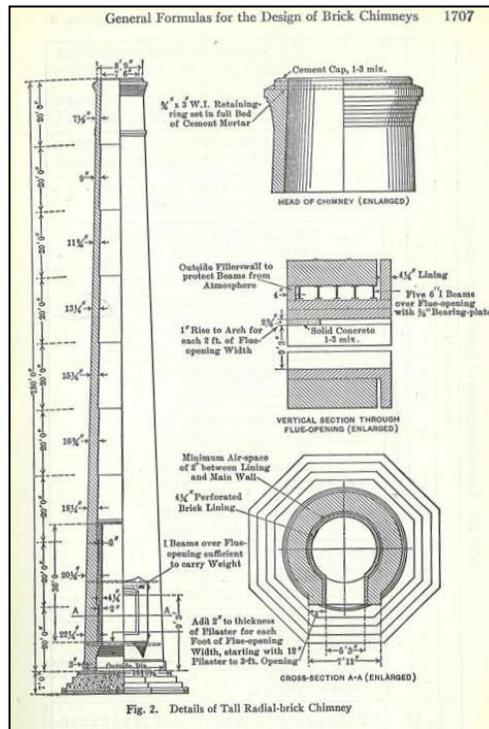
This figure shows the typical profile and cross-sections suggested in Kidder's *Architect's and Builder's Pocket Book* for a tall chimney similar to the King Philip Mills chimney.
